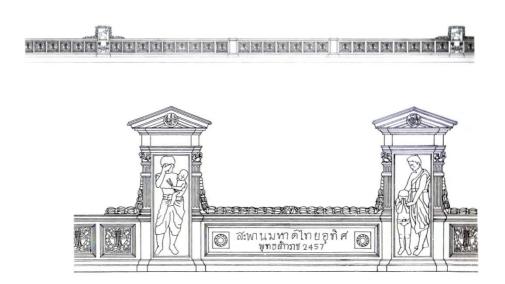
Mahatthai Uthit bridge (source: Architectural drawings of historic places in Thailand, 2008)
